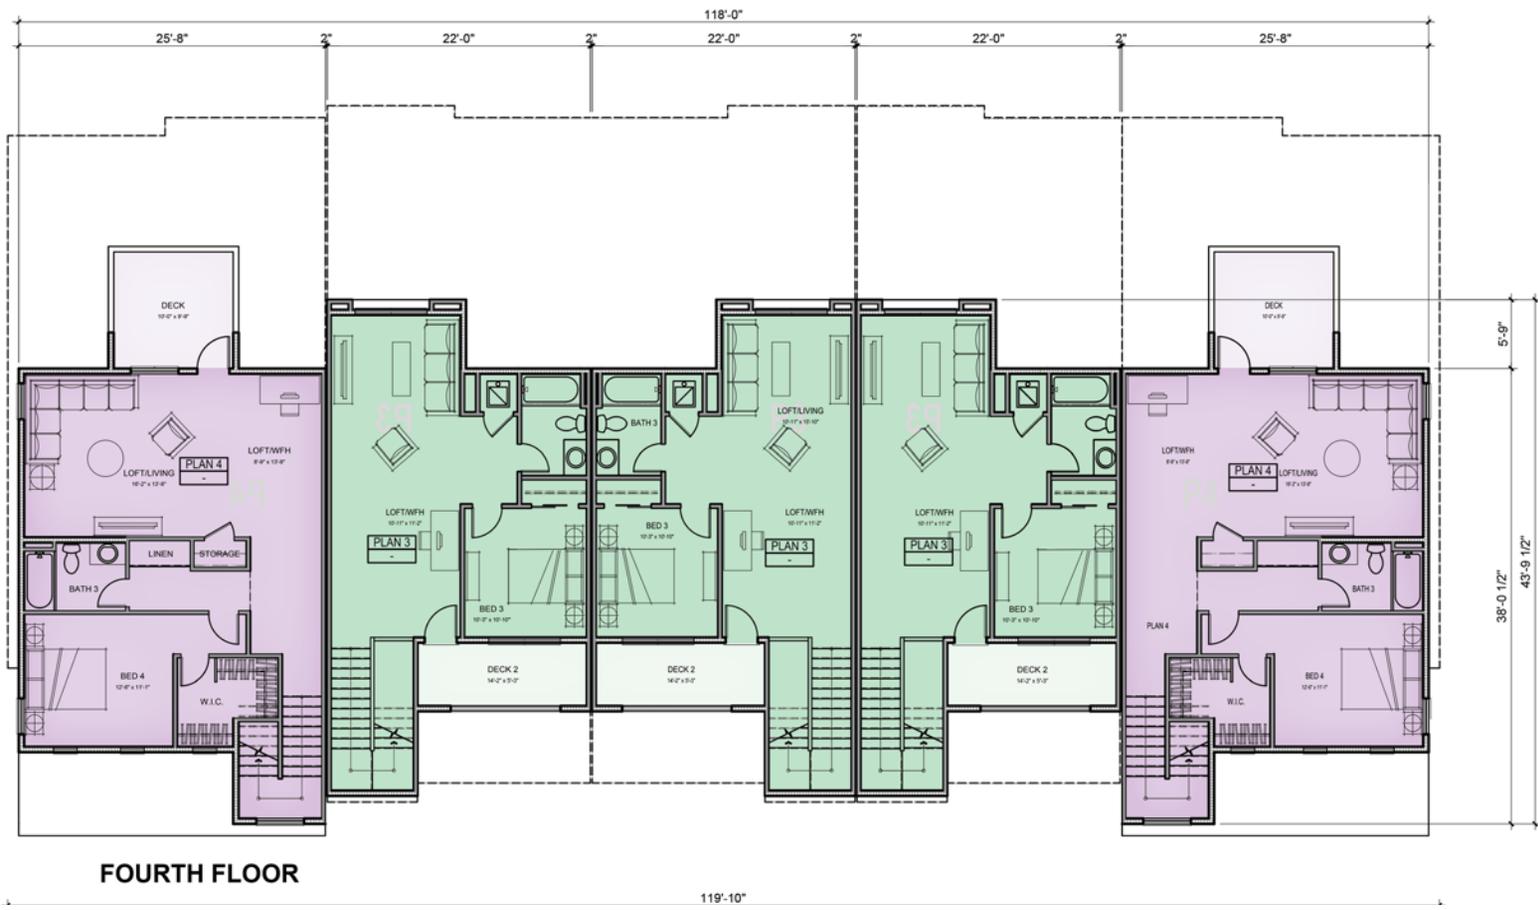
Composite D (10-Plex) Stacked Flats Floor Plans
